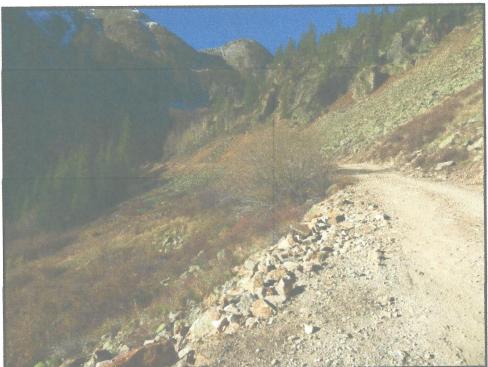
Looking southwest at the cut and fill road construction of Forest Service Road 821 (5SA1876.1) above site 5SA1875 with the waste rock from site 5SA406/1220 left of center.
